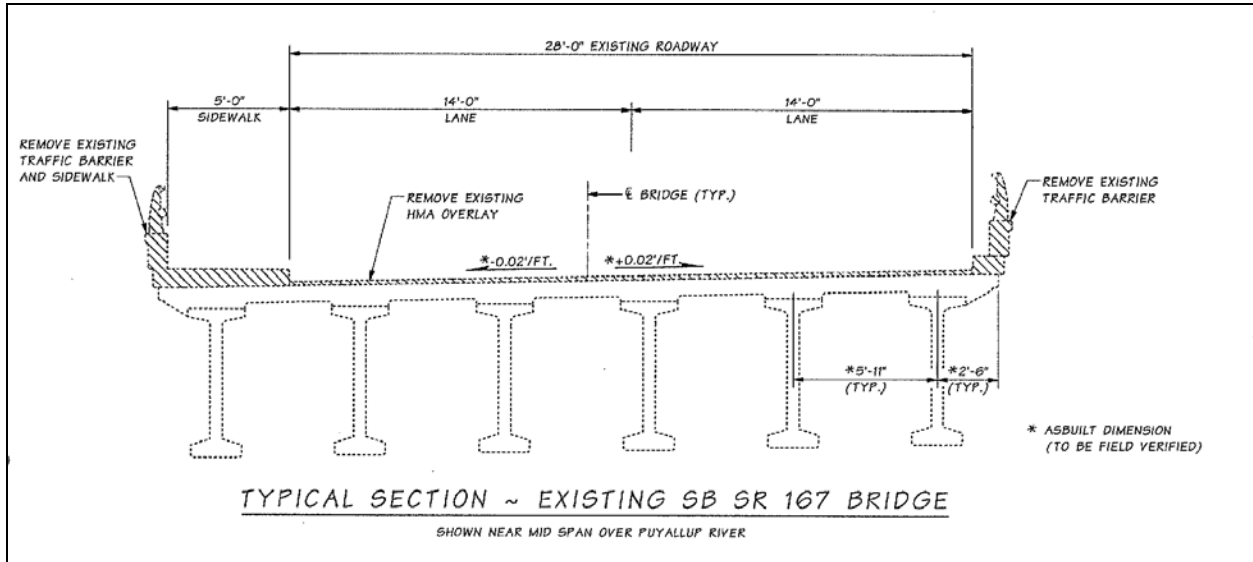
Cross Section of Existing 1970 Bridge (currently southbound lanes)
